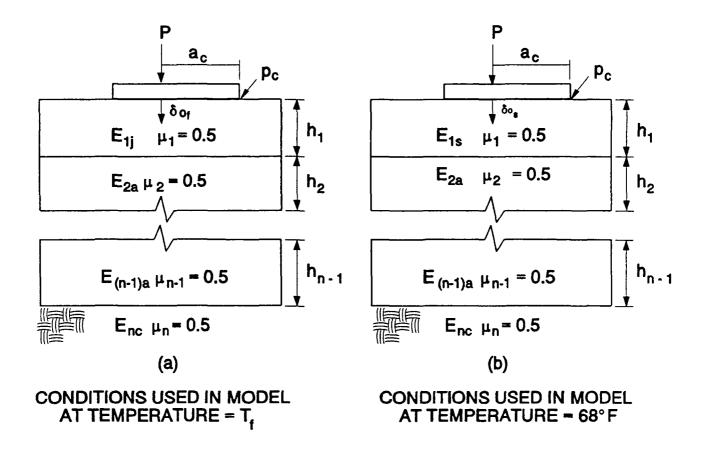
Testing Conditions and Pavement Structure Used in Correction Procedure
